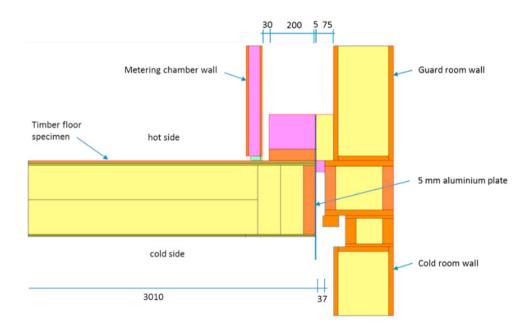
Vertical section, parallel to the joists, showing part of the test floor, Variant 1, and part of the measuring equipment. Dimensions in millimeters. Aluminum plates mounted on the exterior edges of the test floor served as heat sinks to achieve outdoor temperature at the edge beams. Sills and insulation (pink) on the warm side of the floor simulates the lower part of external walls in order to achieve approximately normal temperature distribution in the whole floor structure.
